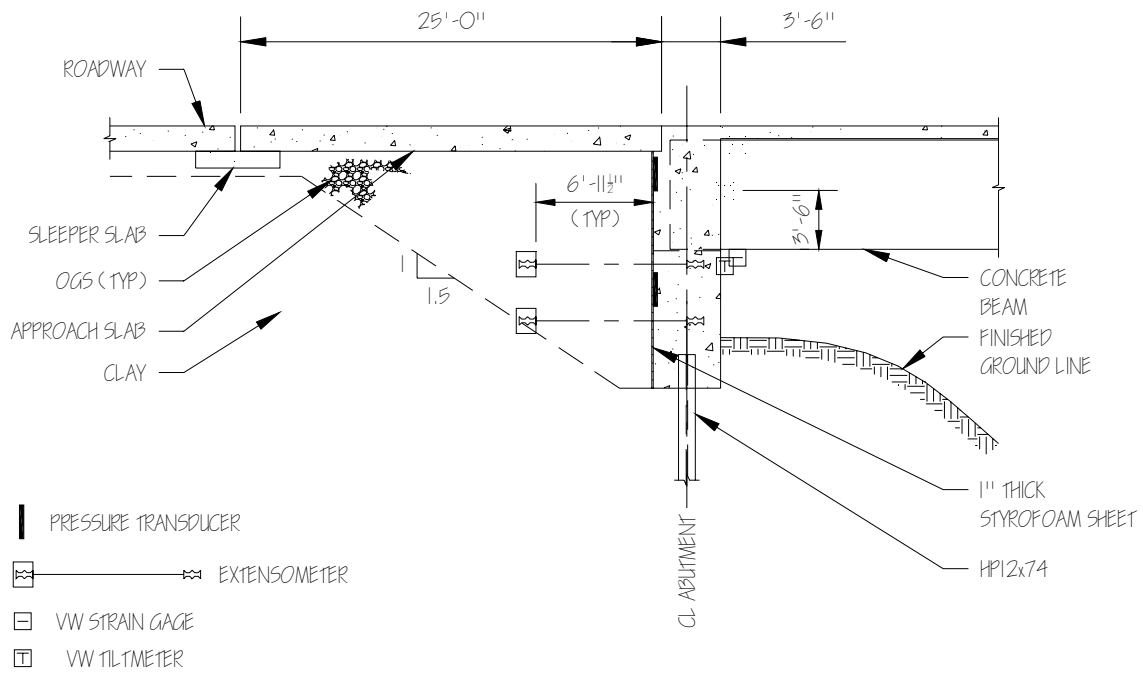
Structure 211 Cross-Section Through Abutment 1 (Section D-D)
